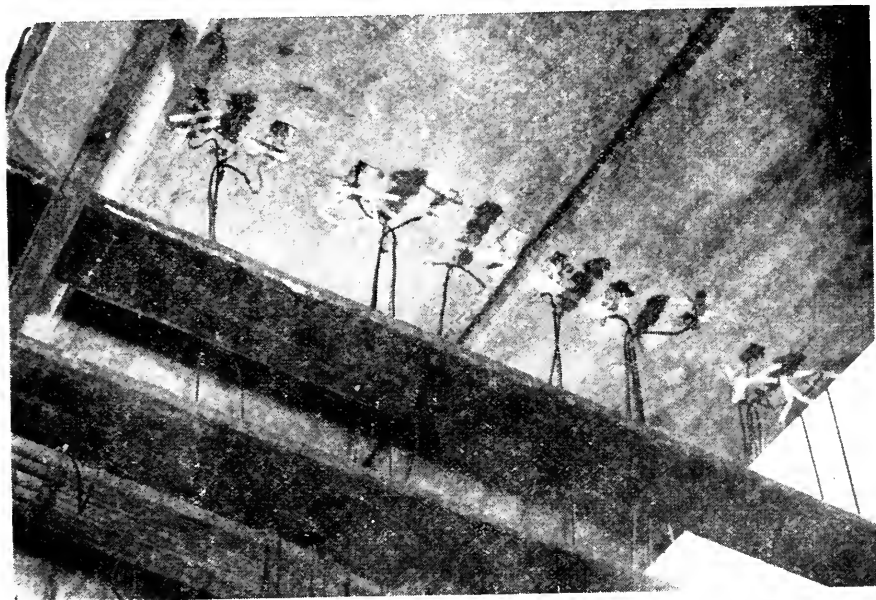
General view of SR4 wire gages on concrete and reinforcing bars at bottom of slab.
